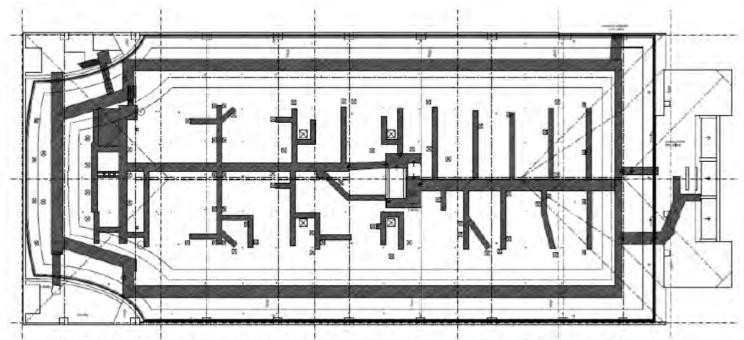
Plan showing existing walkways and access platform in roof void.
